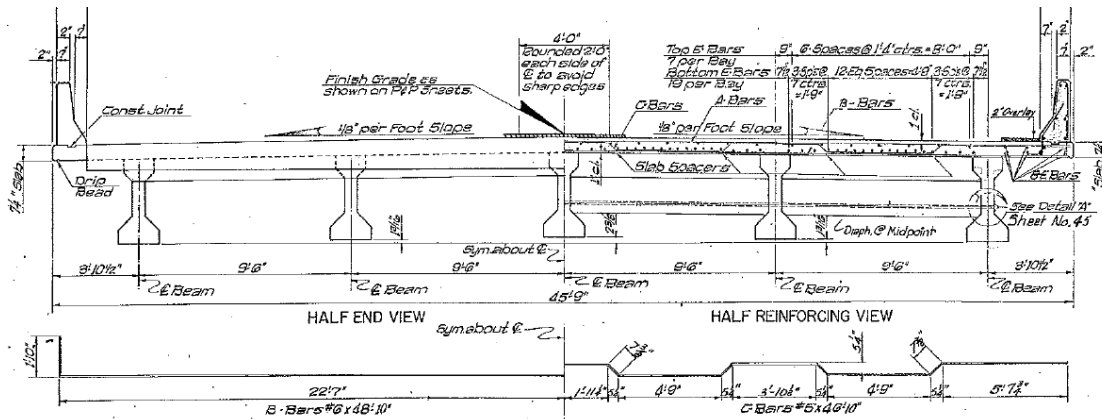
Superstructure typical cross section. Taken from FAS Project No. R.S. 1910(103) plans.
